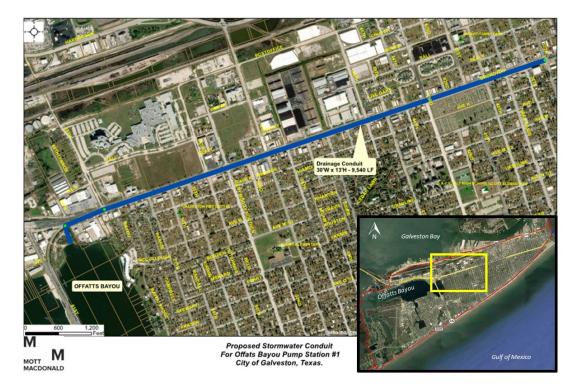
Original proposed stormwater conduit location and size into Offatts Bayou for Pump Site 1.
